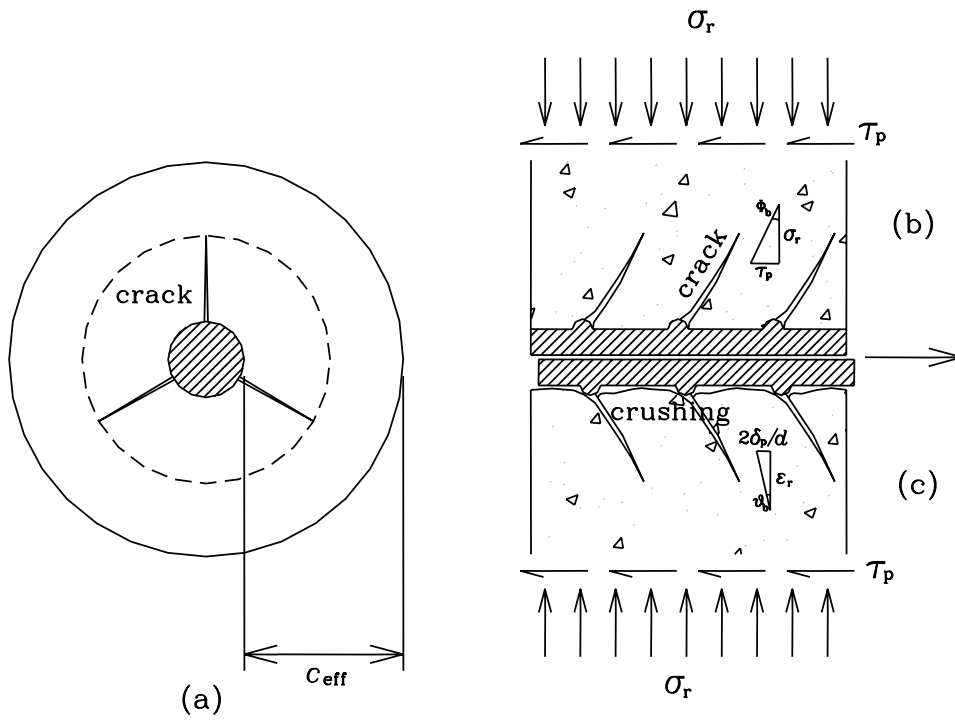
(a) The development of radial cracks in the effective concrete cover surrounding the reinforcement, (b) the mechanical interaction of the cracked concrete and the rib and (c) the crushed concrete near the reinforcement when the reinforcement is pulled out.
